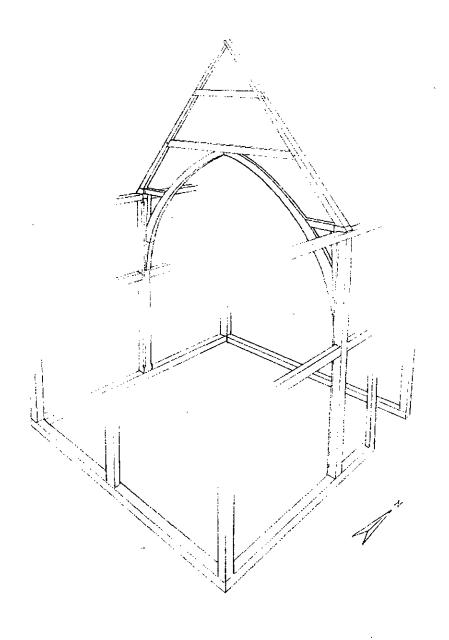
Sketch reconstruction drawing showing form of central cross frame as built.
